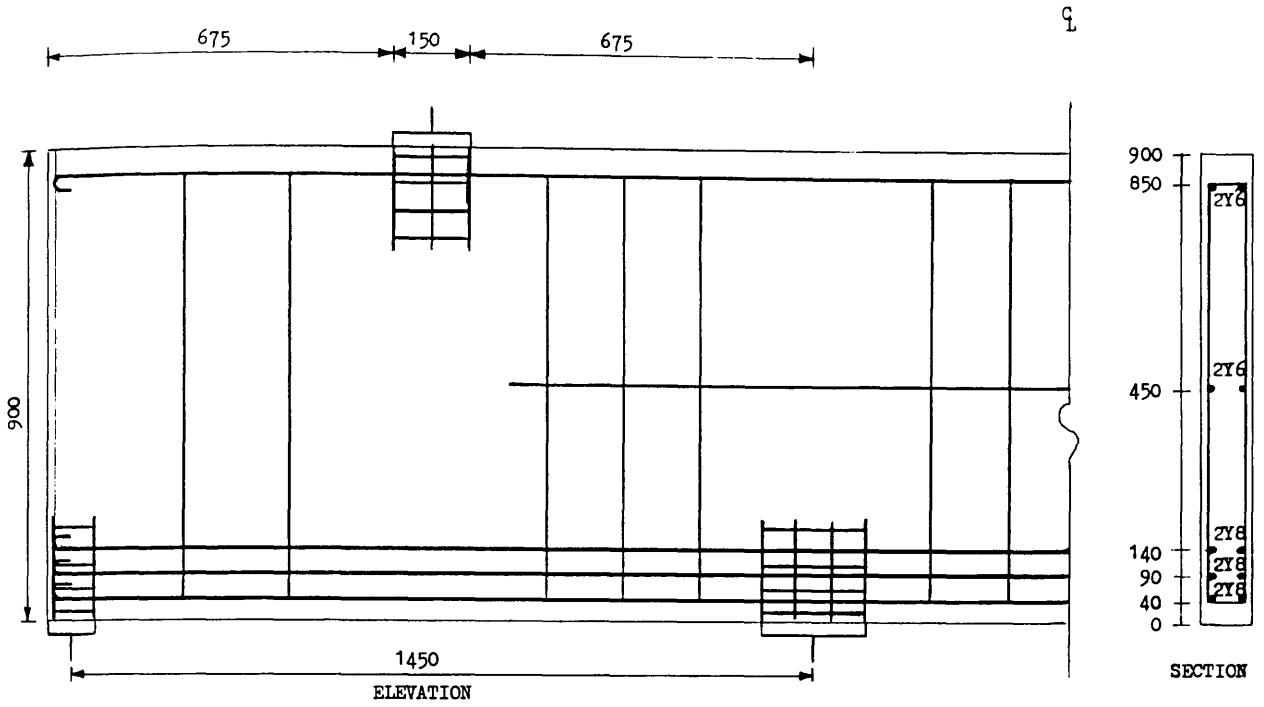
Dimensions and reinforcing details of girder TRGRAS2
